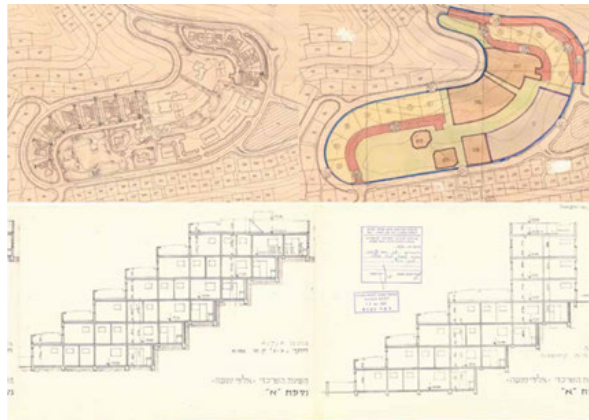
The Central Area Plan – Upper row – layout (left) and zoning (right). Bottom row: section. 1985. Perlstein Architects & Partners (ILA)
